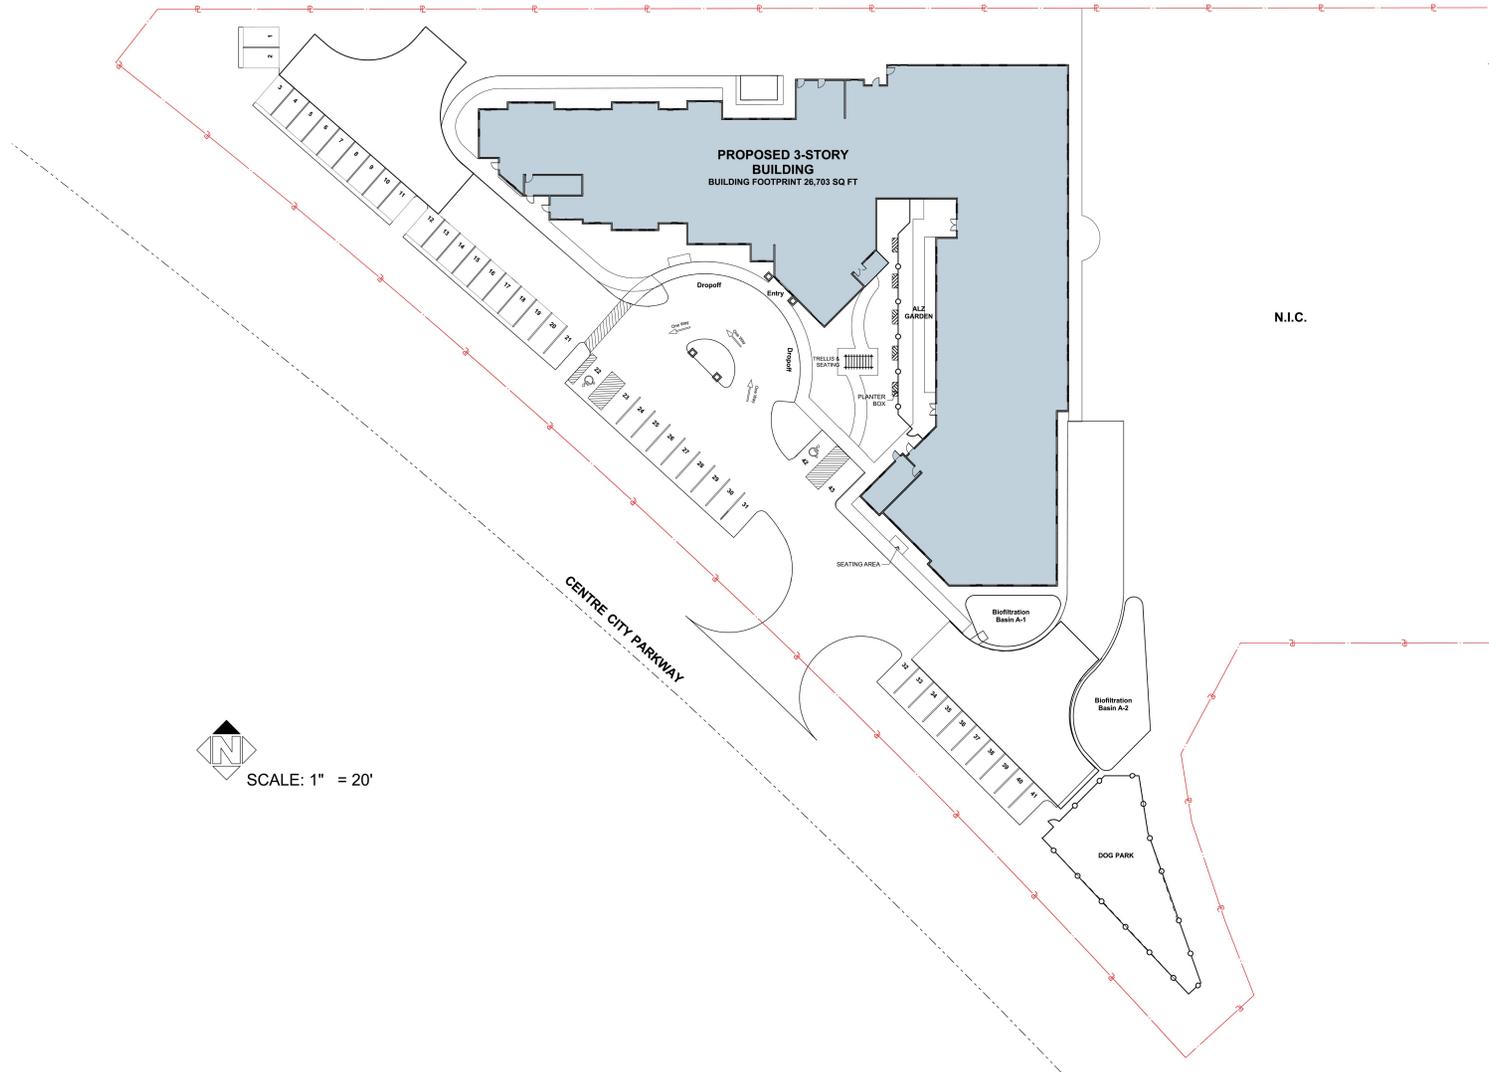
Proposed Escondido Assisted Living Facility Development Plan (Irvin Partners Architects, 3/18)
